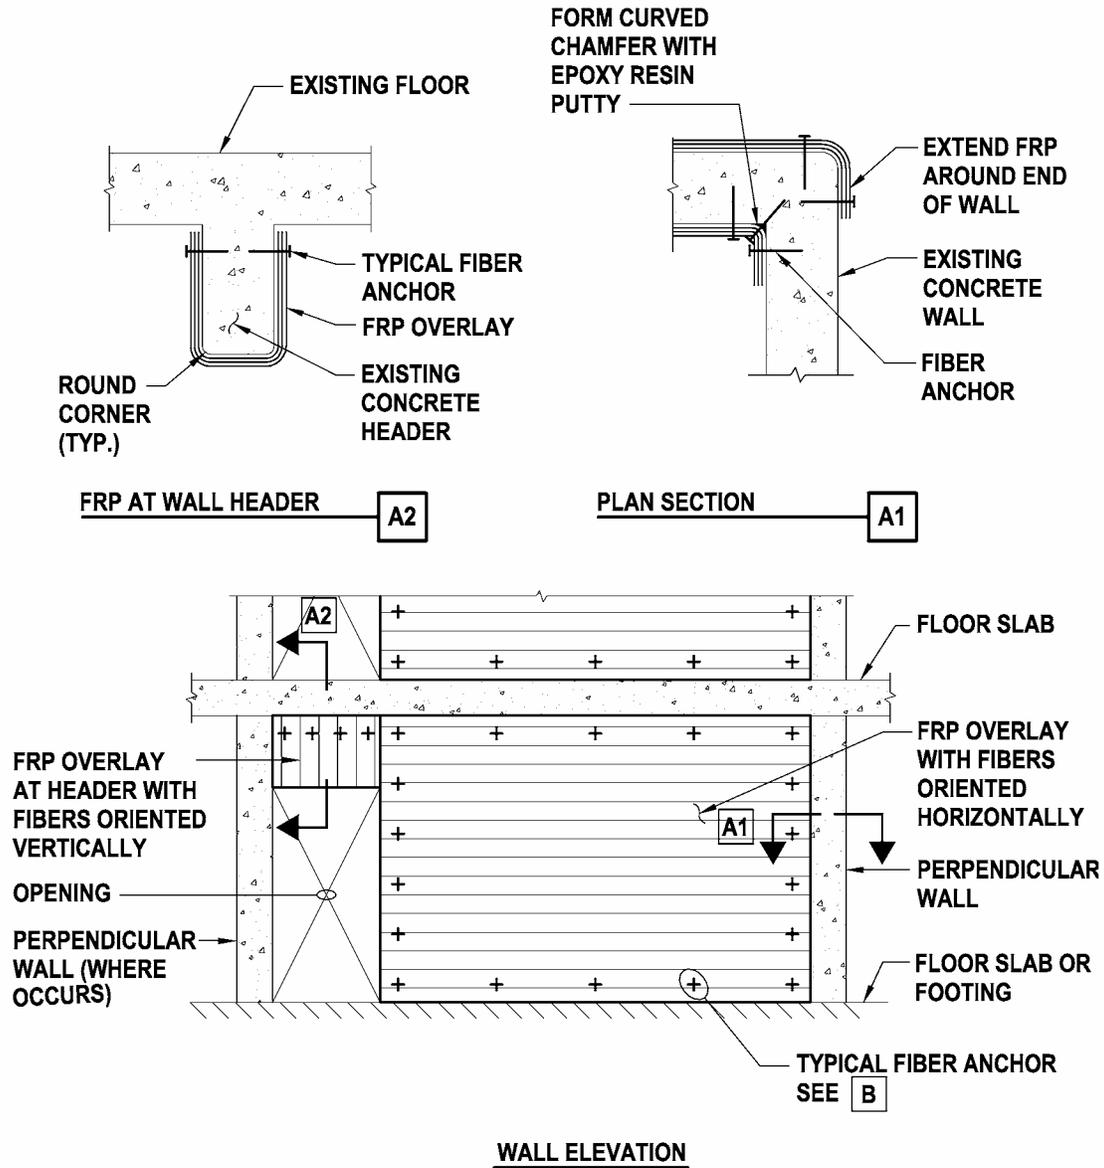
A: Shear Strengthening of Concrete Shear Walls Using FRP Composite
